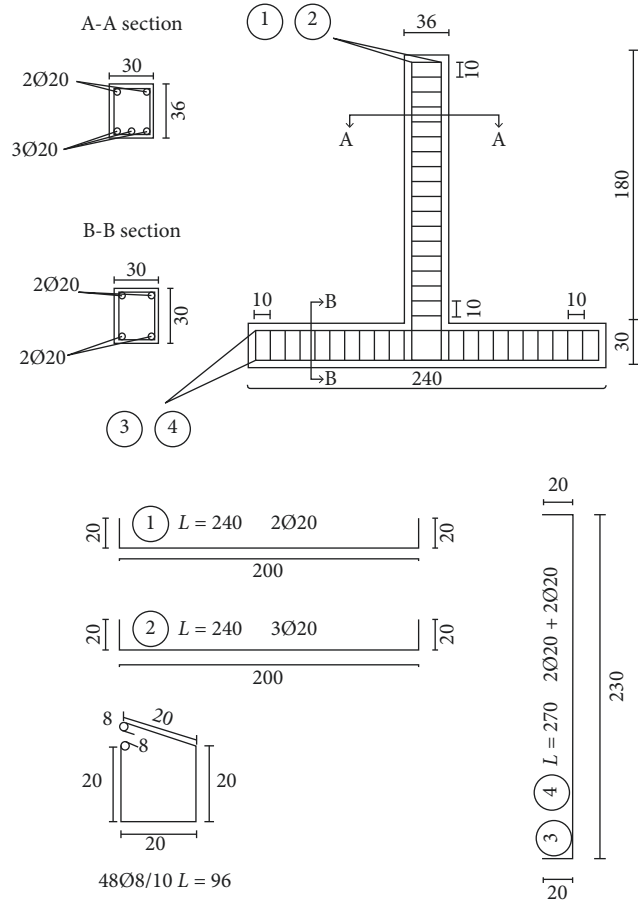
Design of reinforced concrete beam-column for the control sample.
